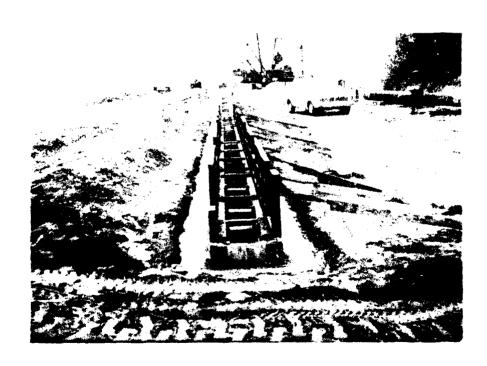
Last concrete placement at west end of guidewall. (November 10, 1983)
